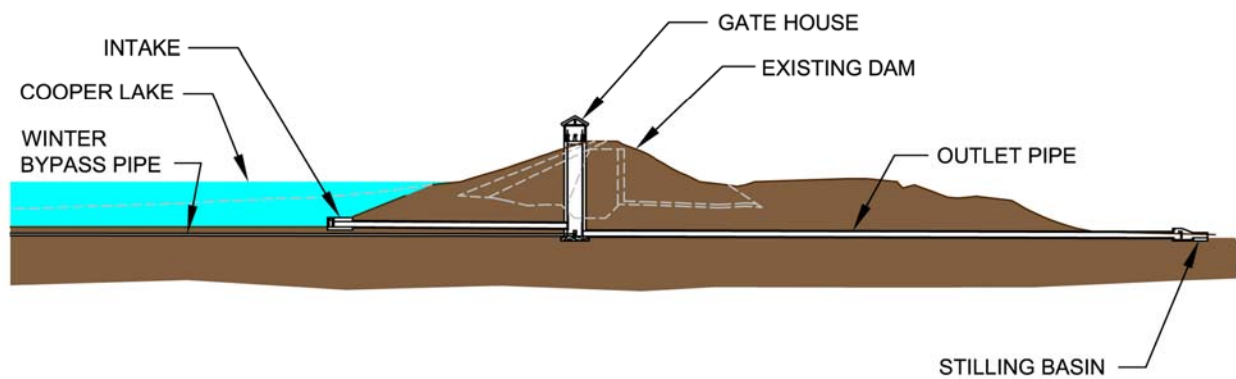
Section of Gravity Outlet Structure with One Pipe
